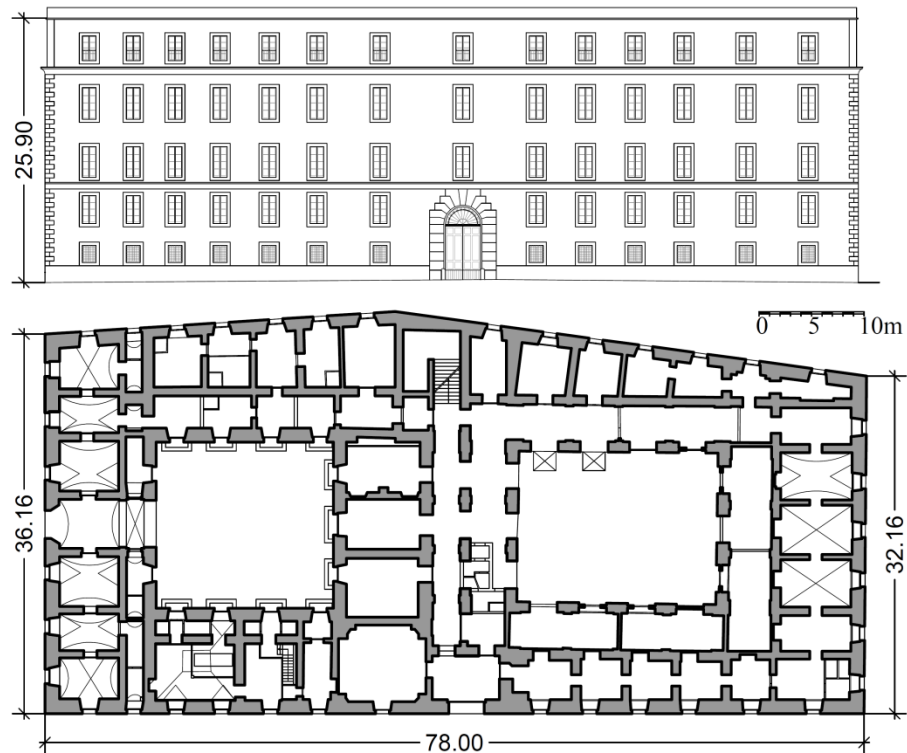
Ex prison S. Francesco* : frontal view and plan of the first floor
